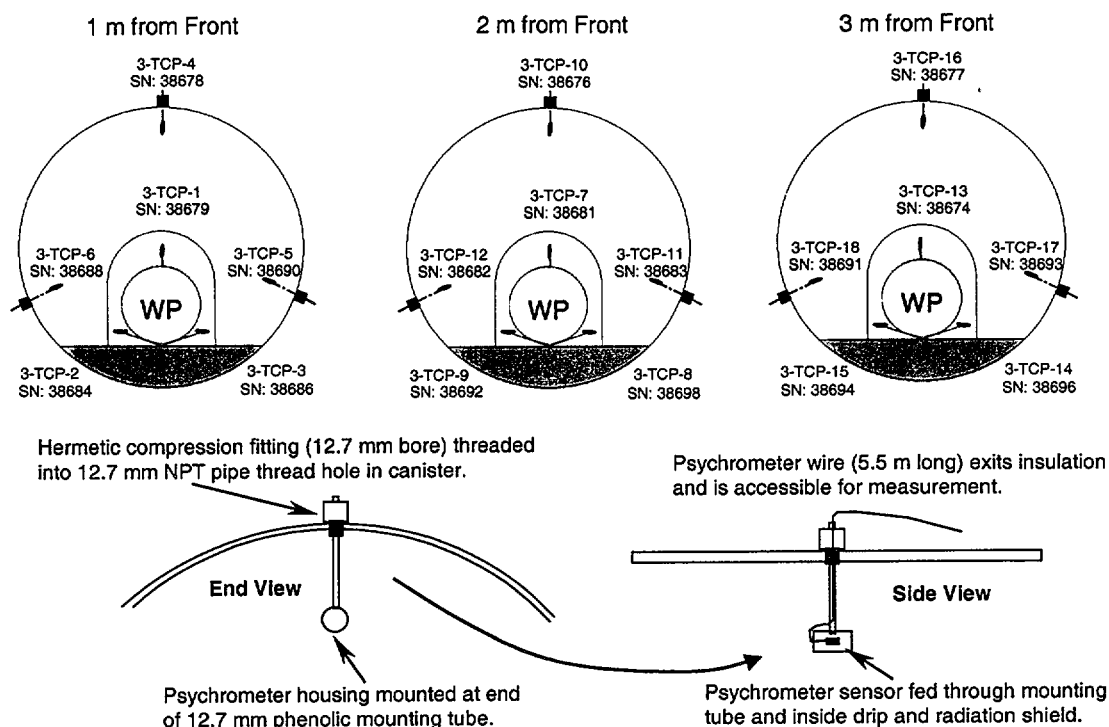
TCP Layout in EBS Test #3 (Howard 2000, Vol. 1, Sections 4.3 and 4.4)
